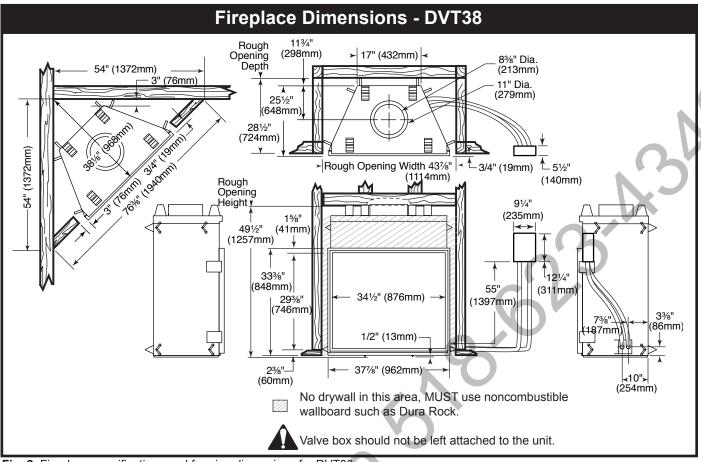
Fireplace specifications and framing dimensions for DVT38.
